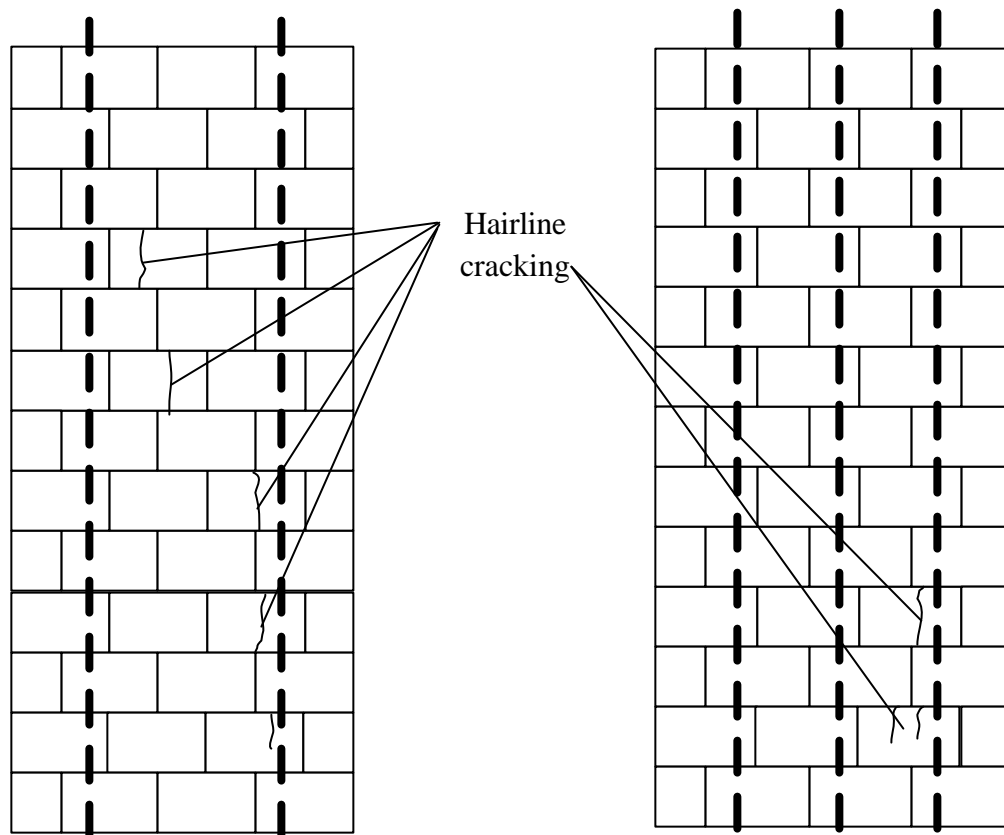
Locations of Hairline Crack in 56-inch Wide Wall Specimens
